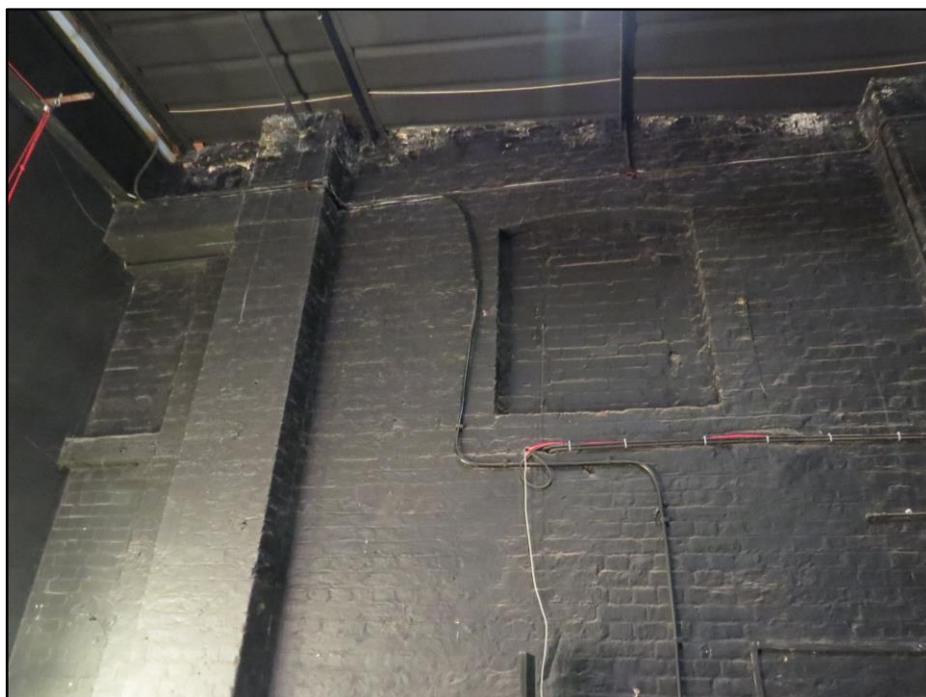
Infilled windows in Studio 3 which may have been the original canal frontage of the building, since superseded by various stages of building closer to the canal
